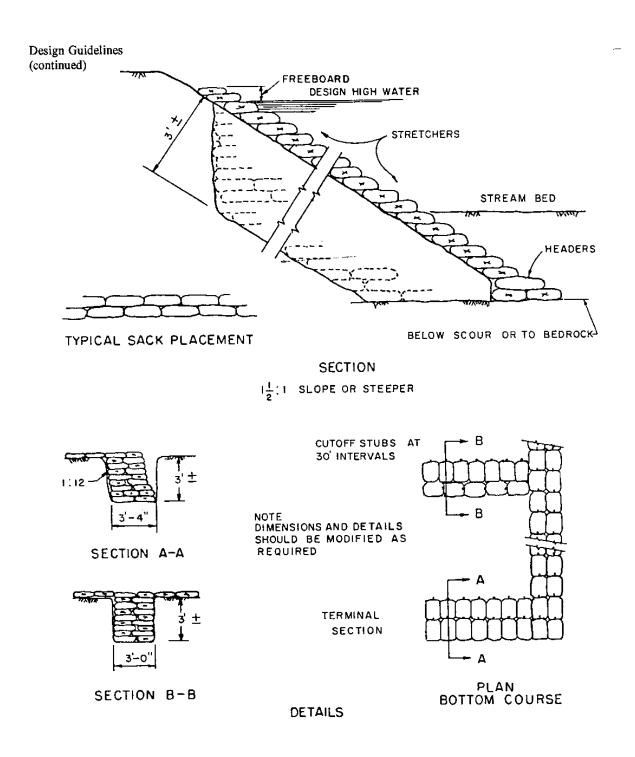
Typical Section and Details Of Sacked Concrete Slope Protection
